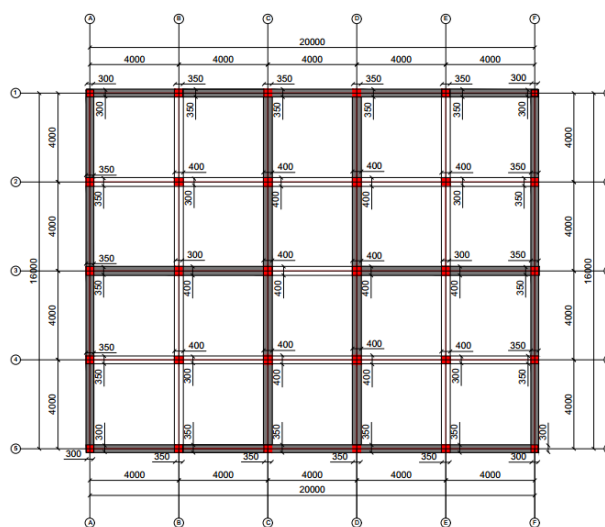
Structural Plan view of 3, 6-Story frame (units in mm)
